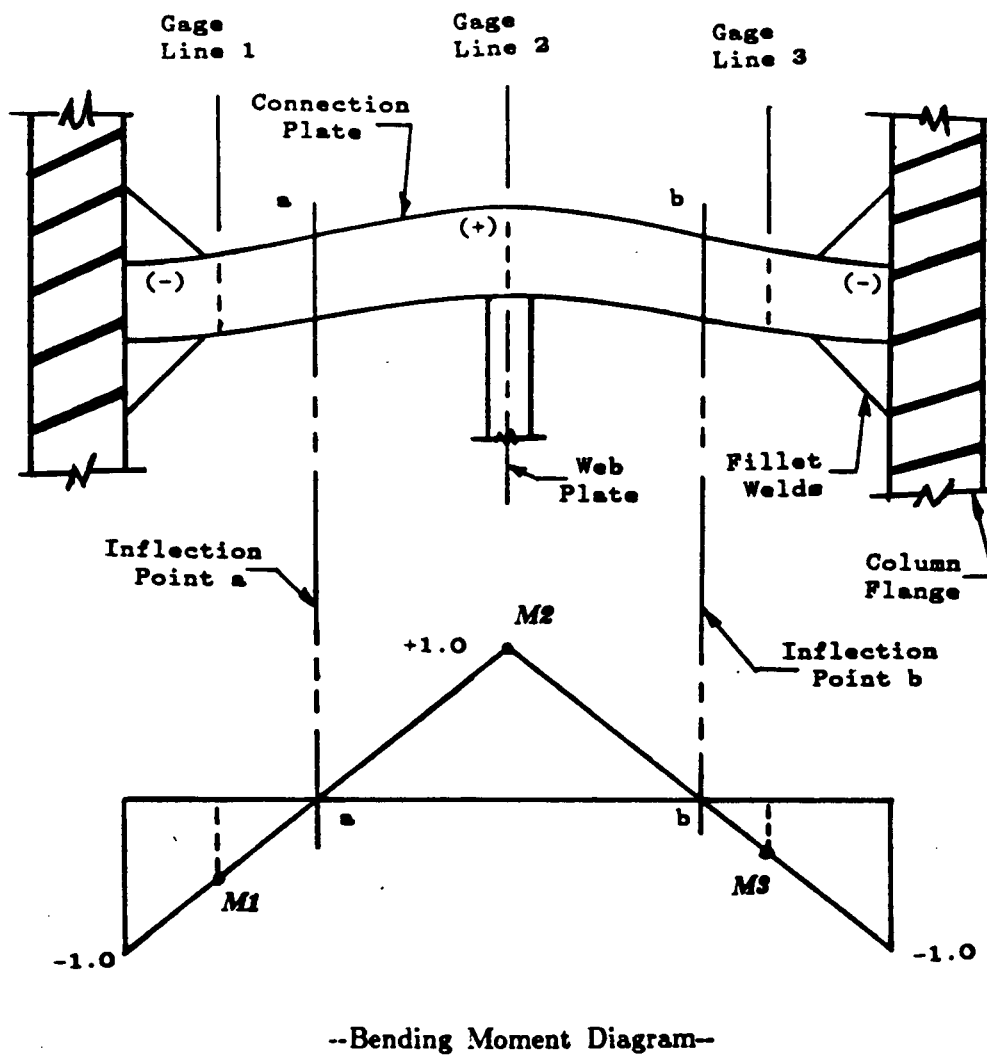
Fixed End Beam Supports for Top Flange Plate
